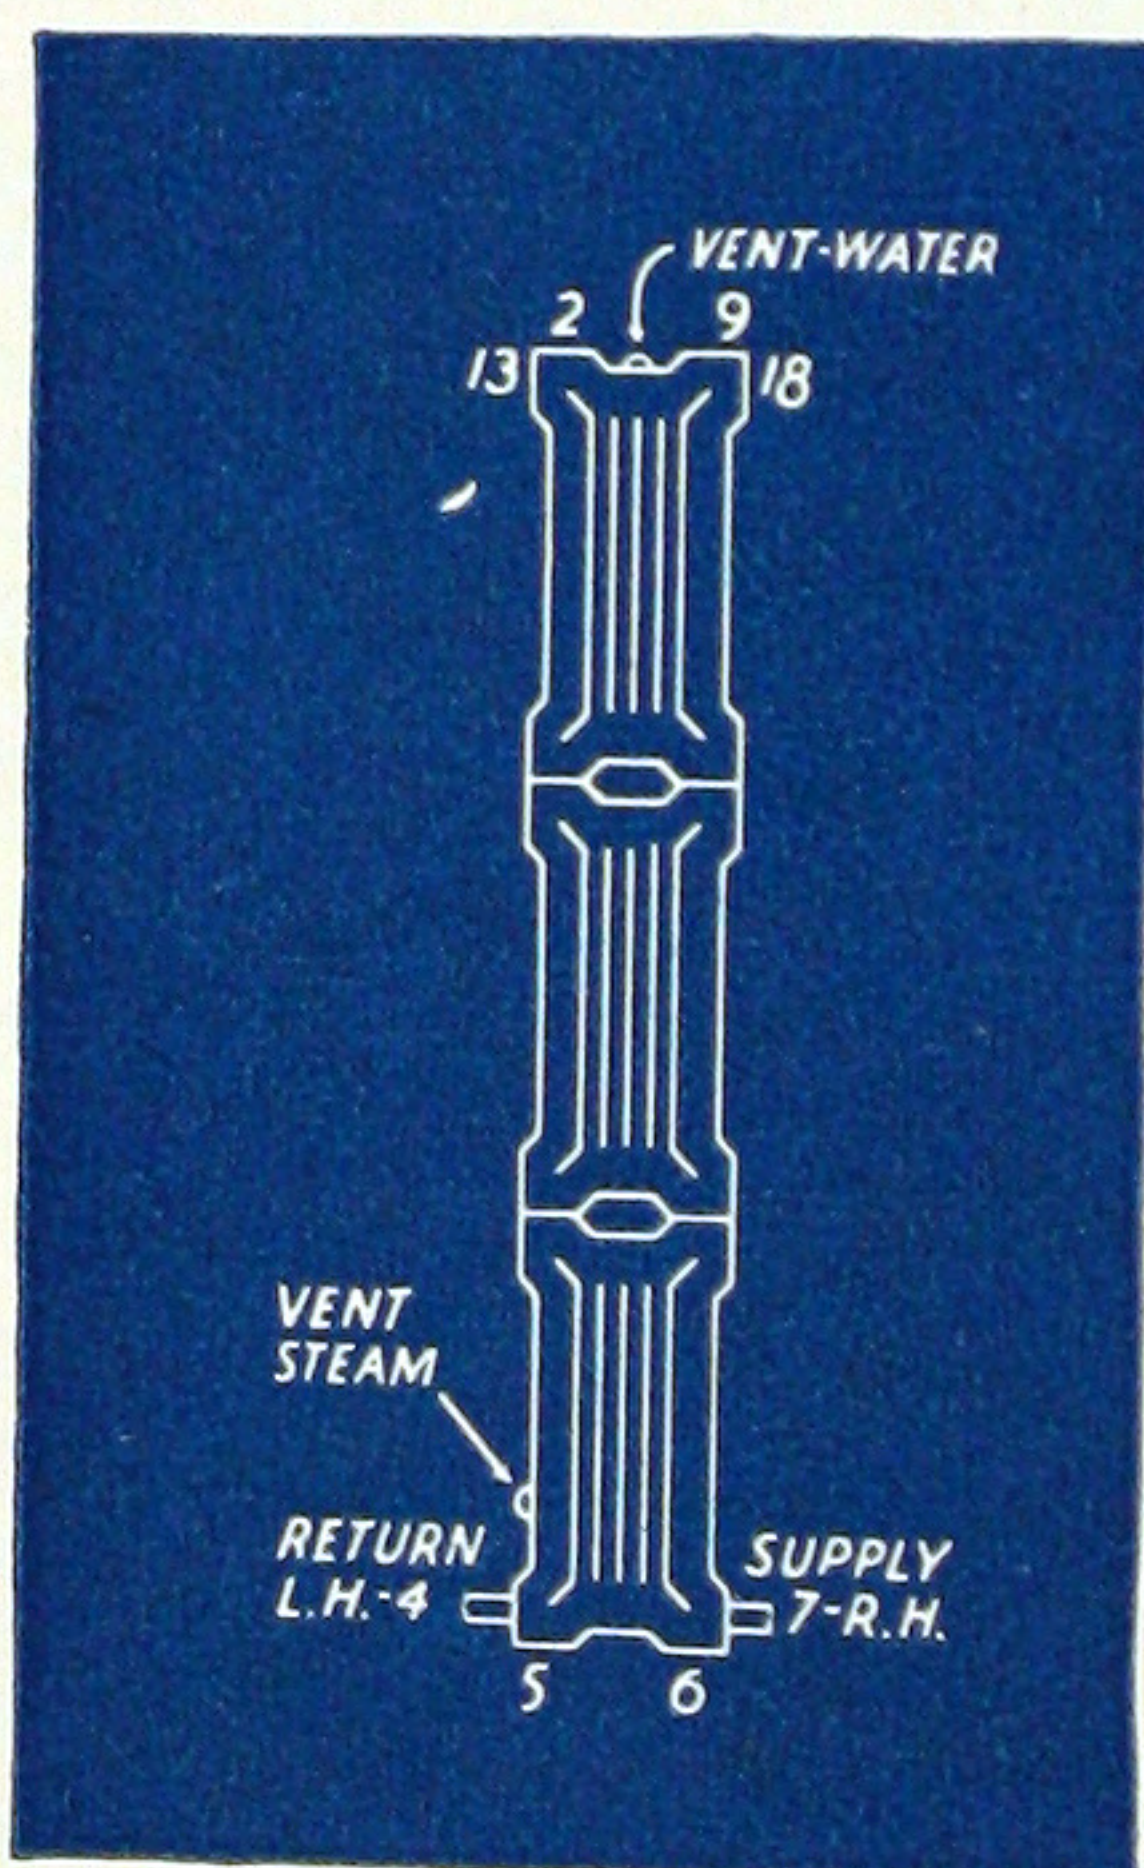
Assembled in single stack. Water or one and two pipe steam.
